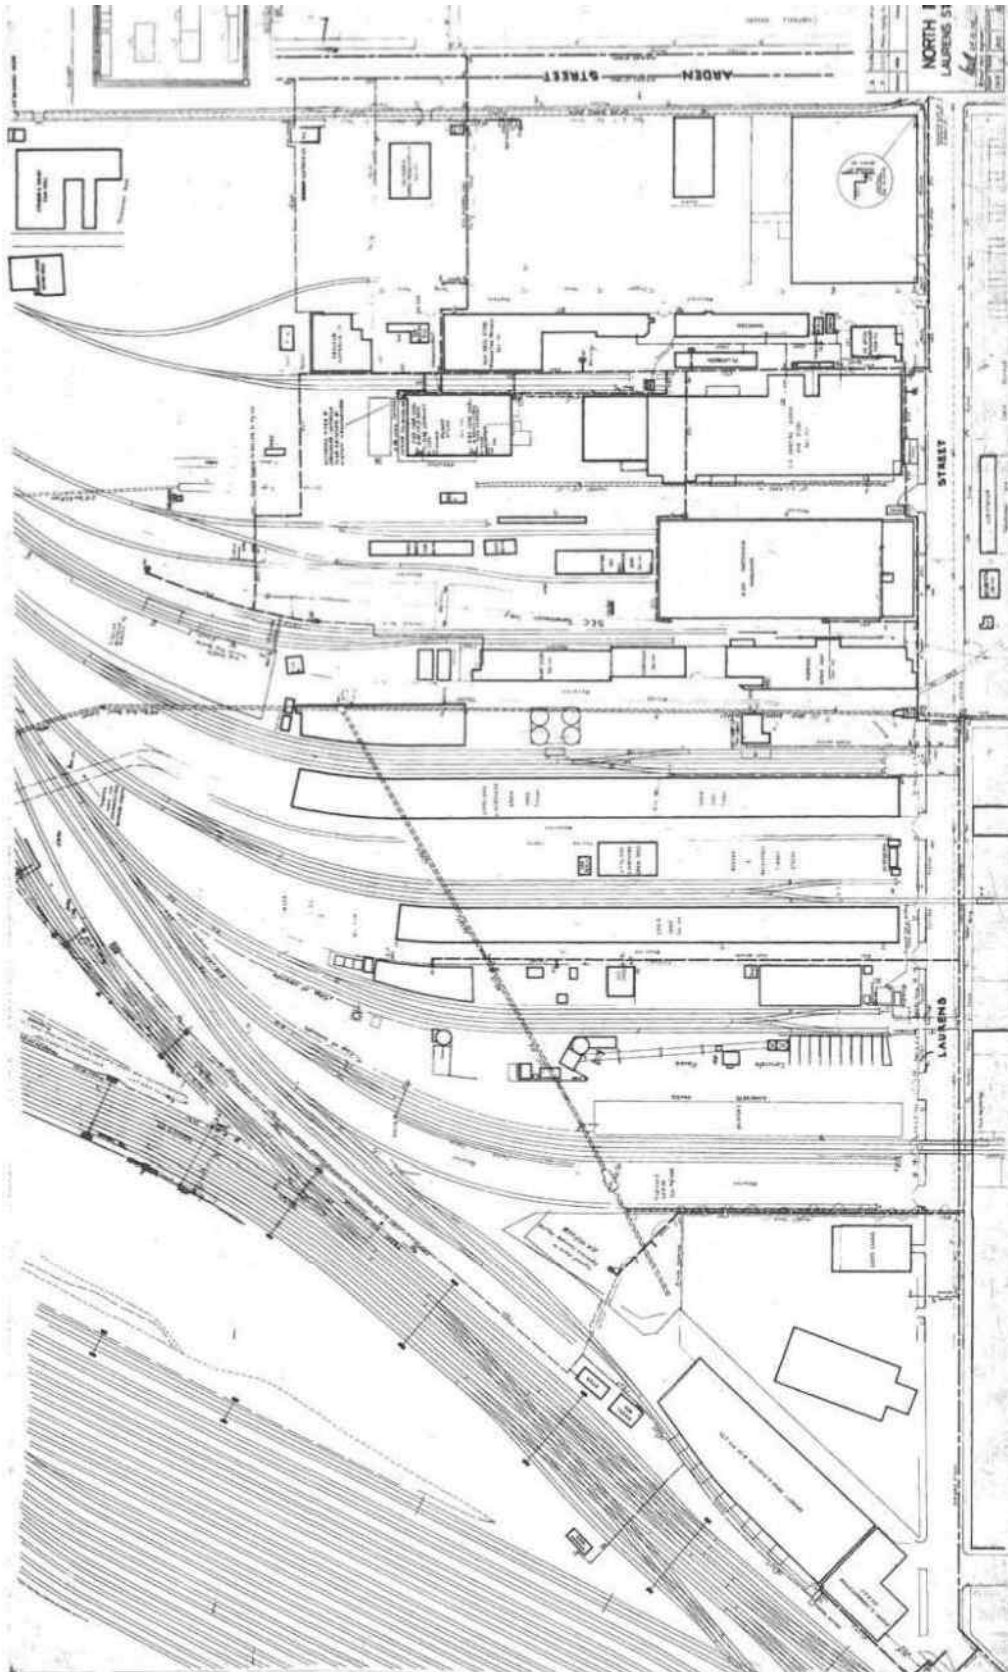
1970 plan showing the mid-late twentieth century development of the Arden station precinct site
